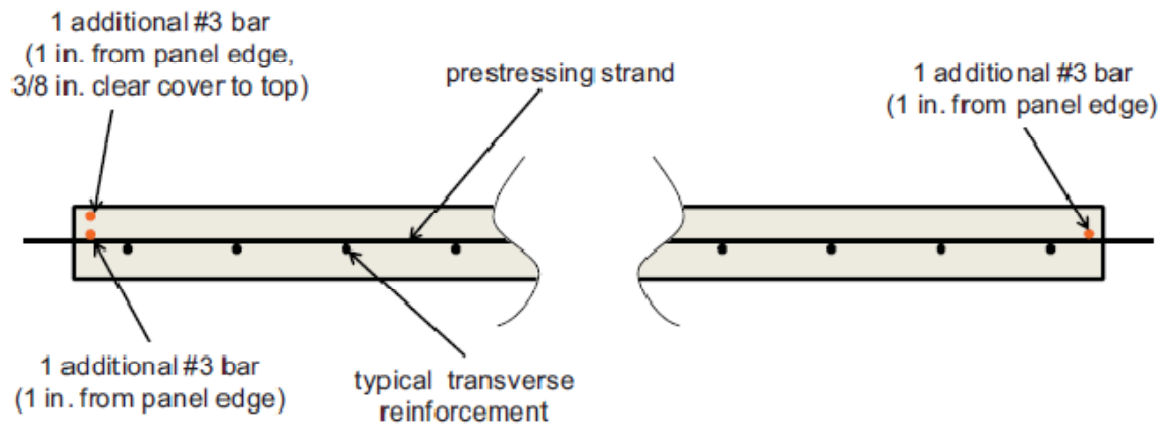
Section View of Layout of Reinforcement in Panels M3, M4, and M5
